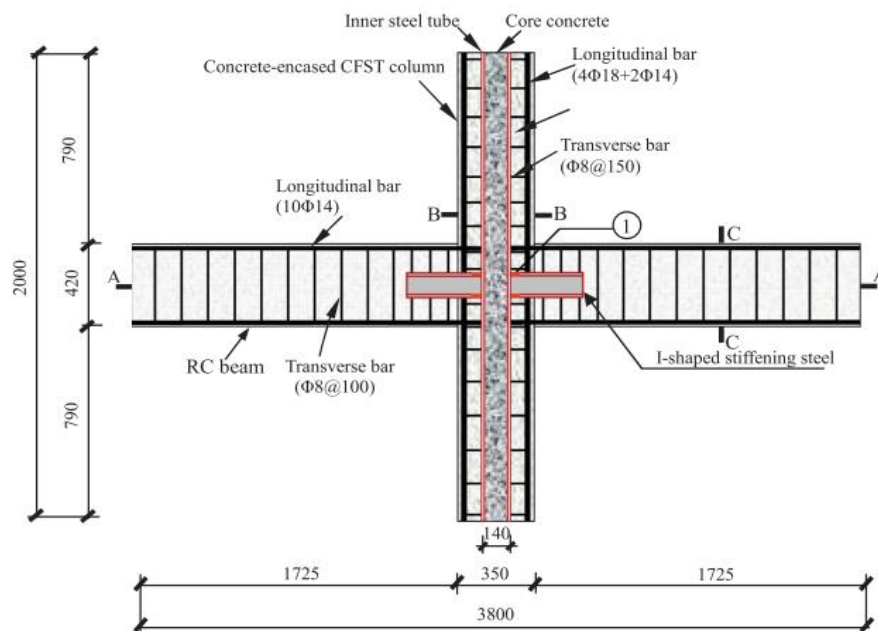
Details of specimens ( Q. J. Chen, Cai, Bradford, Liu, & Zuo, 2014)
